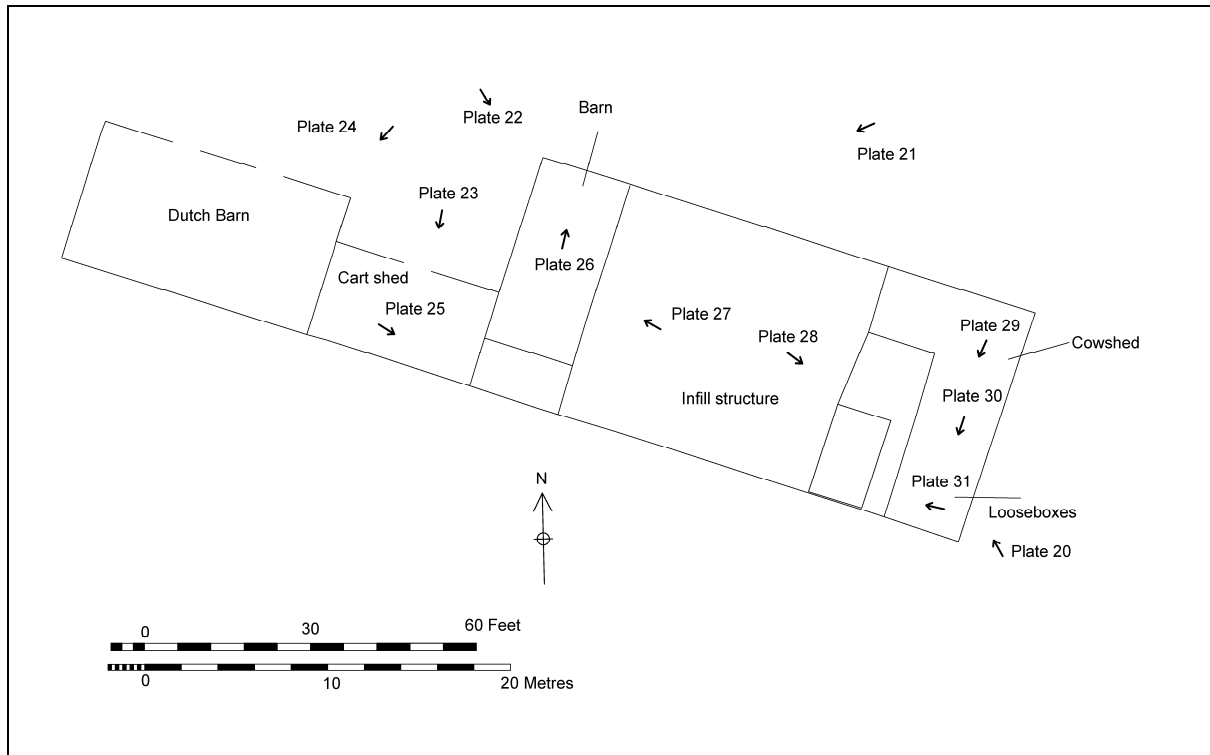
Block plan showing outbuildings, with location of plates 20-31 added.
